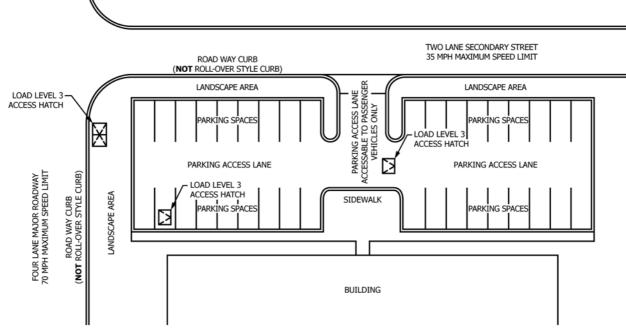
Plan Showing Appropriate Locations for Load Level 3 Access Hatches—Light Vehicular Traffic
